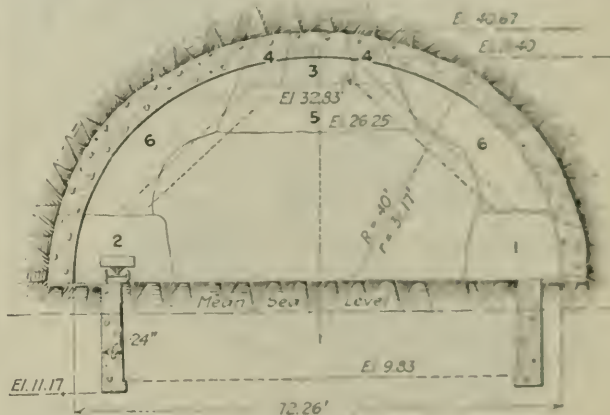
SECTION OF THE ROVE SHIP TUNNEL
